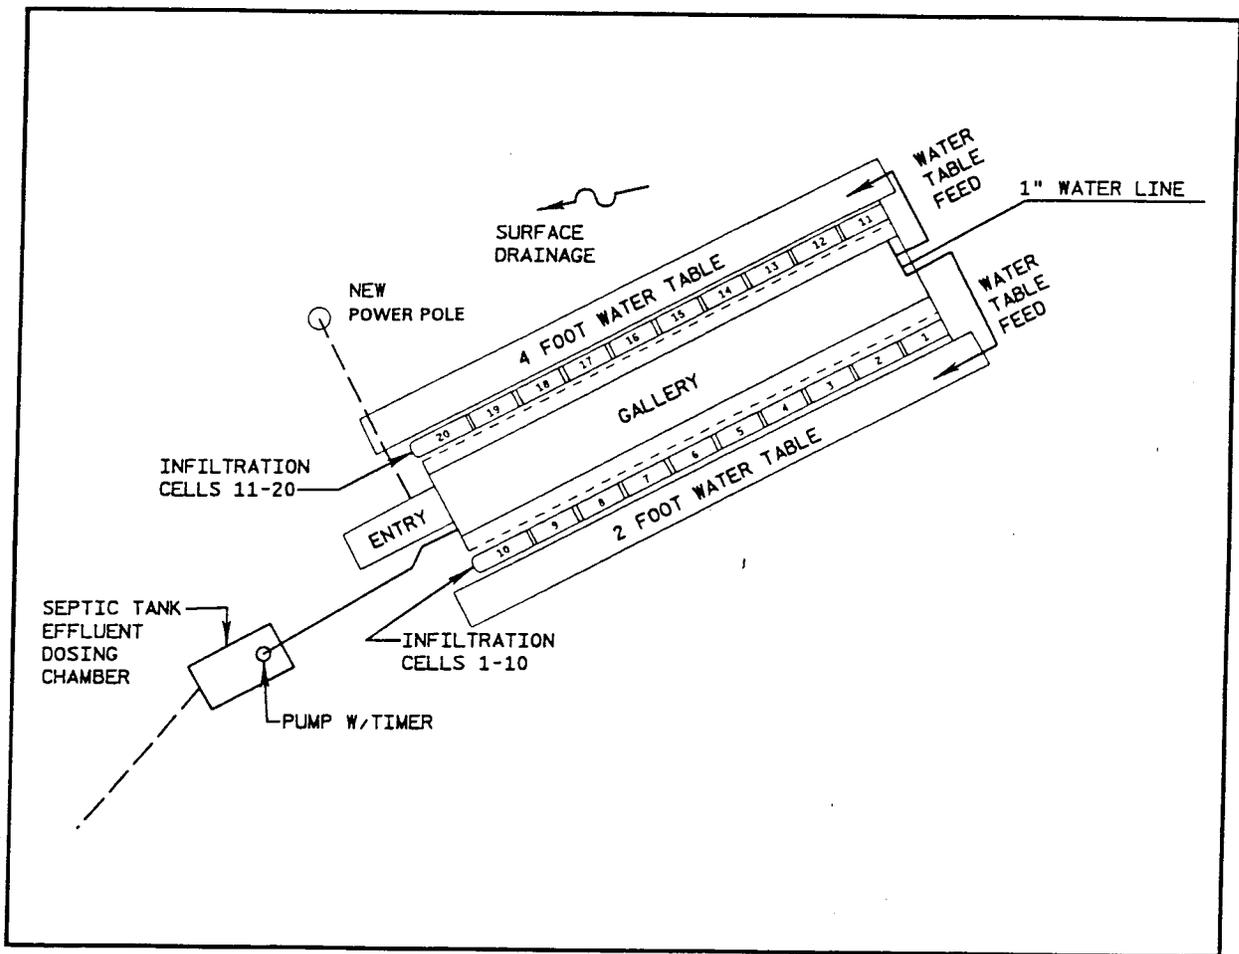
Plan View of Lysimeter Station Facility.
